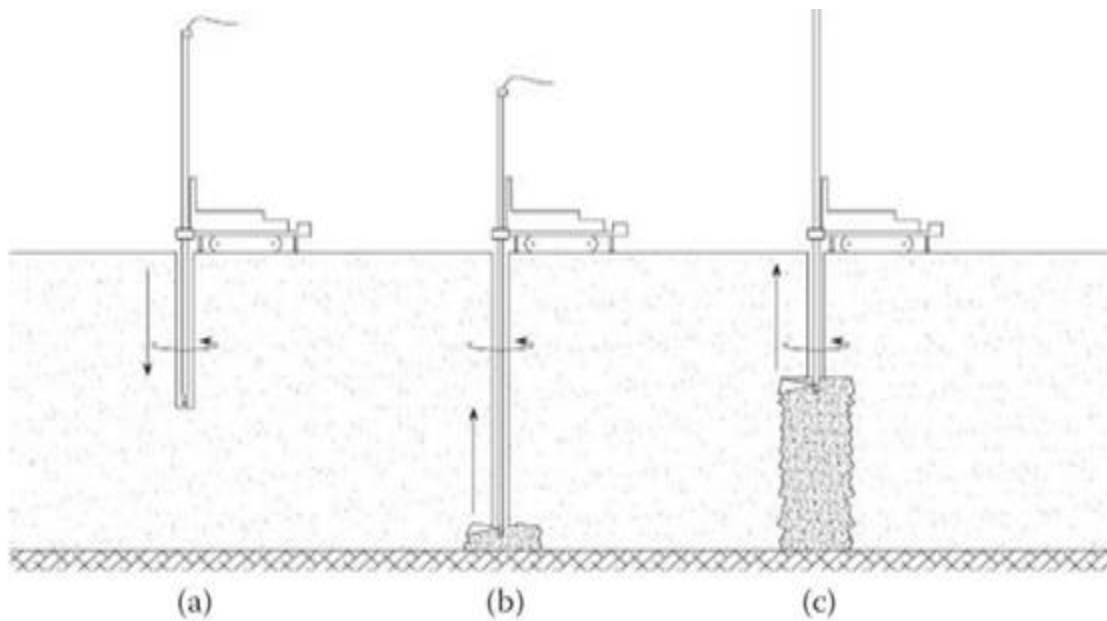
Typical jet grouting procedure: (a) drilling; (b and c) jet column formation (Croce et. al. [28]).
